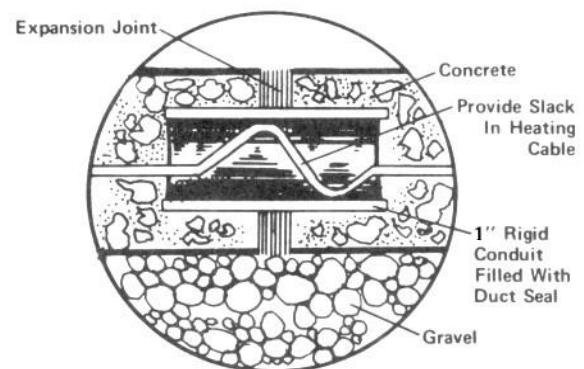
B METHOD OF CROSSING EXPANSION JOINT
